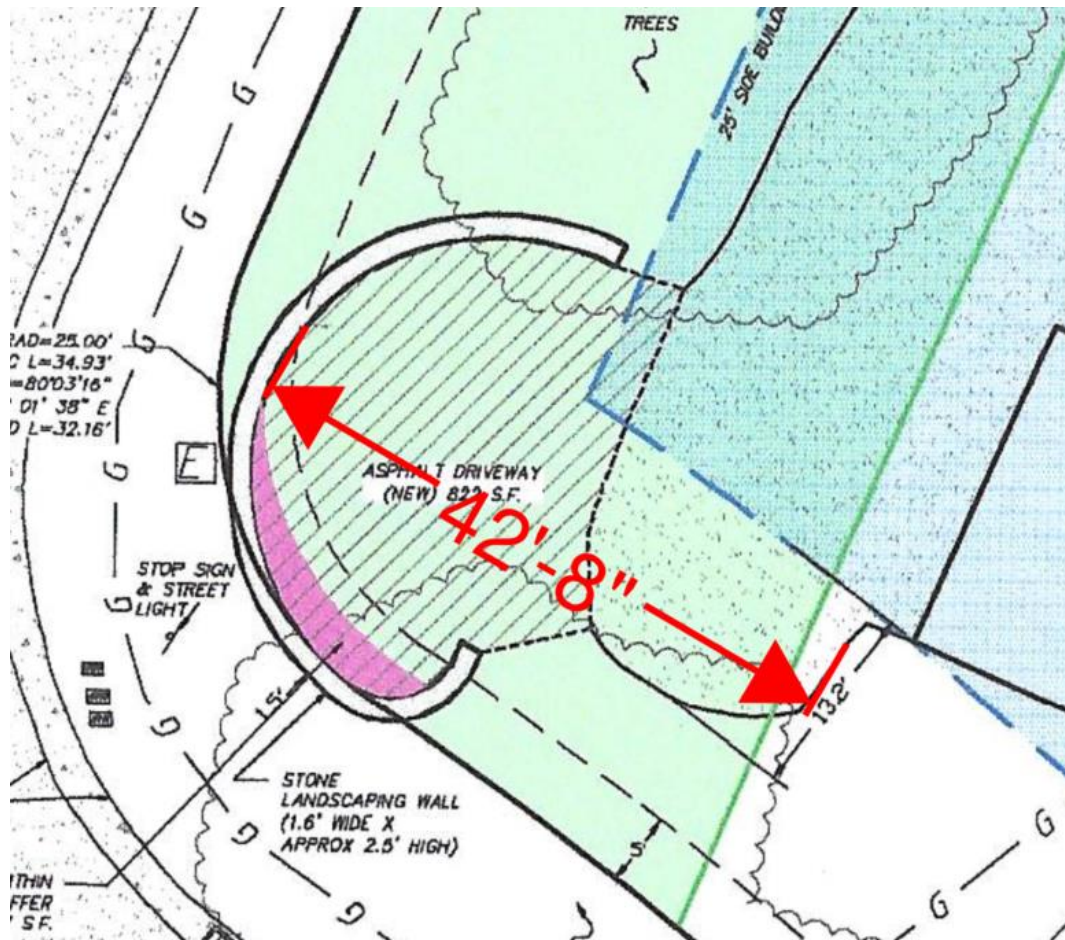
Applicant's Site Plan with Staff's Measurement of Driveway Width
